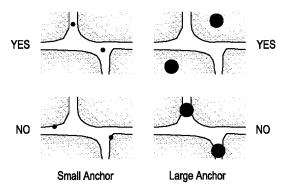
Anchoring devices for the support of signs and other wall-mounted items should be anchored with minimal damage to historic wall materials. In masonry walls, small anchors should be inserted in the mortar joints, while large anchors should be held back from the mortar joint, not overlapping the joint.
